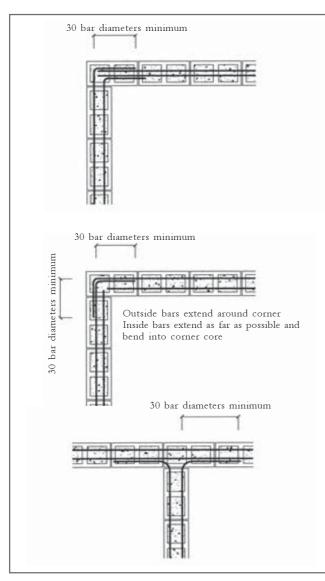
Typical detail of reinforcing steel for bond beams at corners of intersection walls
